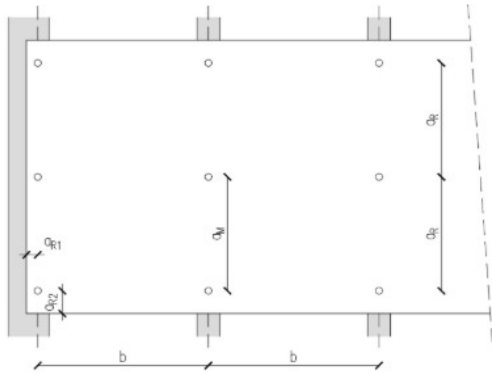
Excerpt from Rockpanel Section 5.1 – Recommendation for an application of 2 or more field span
